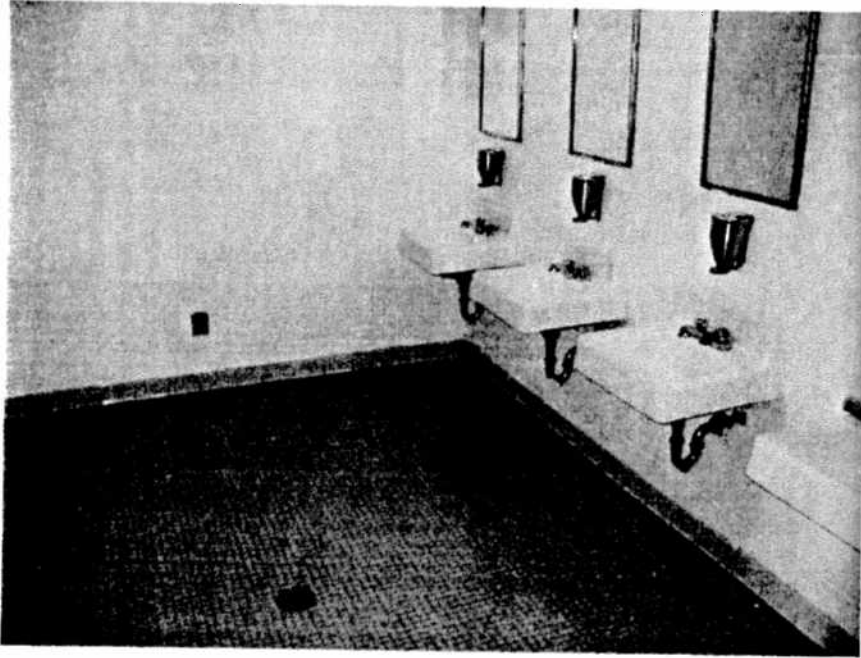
Restroom facilities in west wing of building. Note floor drain typical in restrooms found in the facility.
